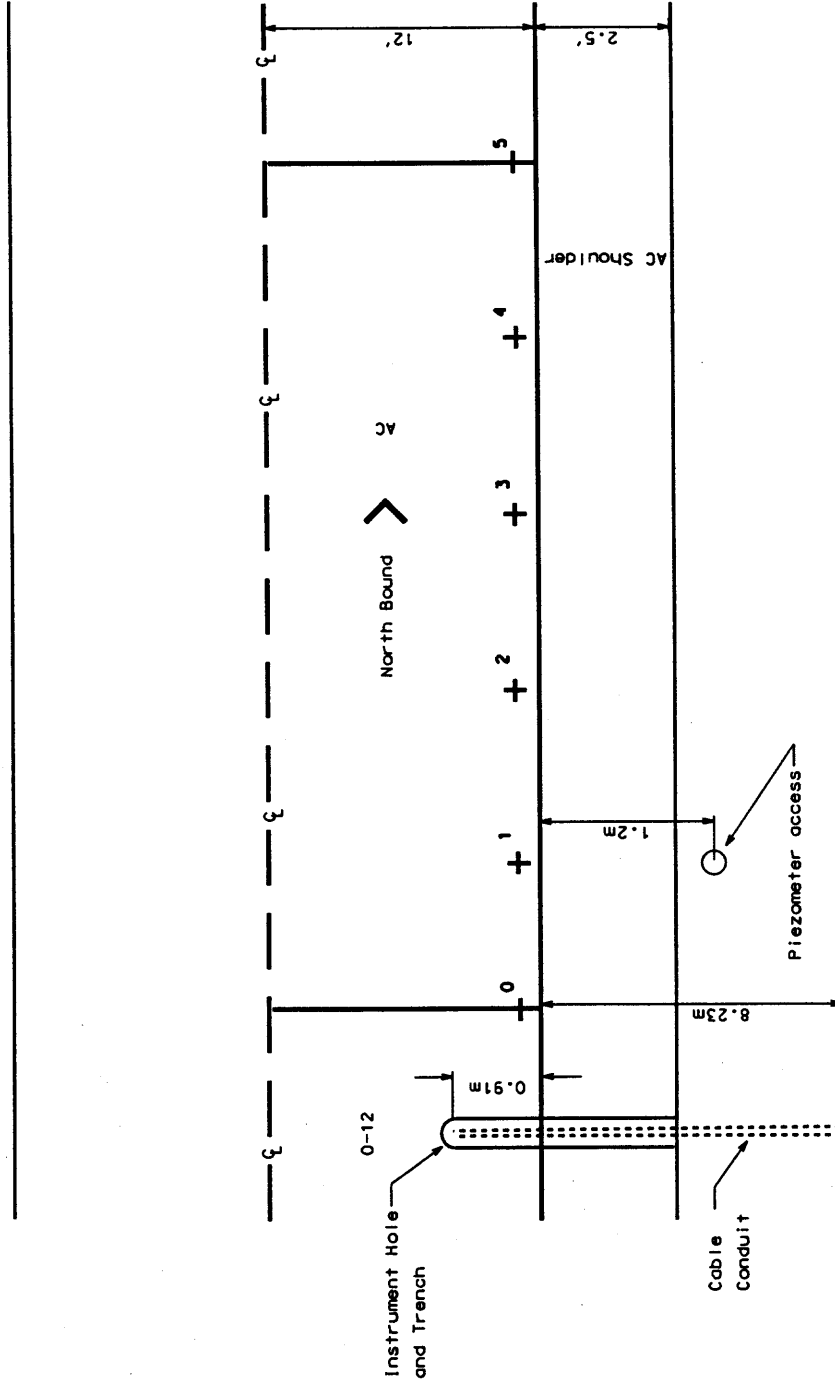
shows the locations of the installed instrumentation at the site after close-out. The instrument hole is at Station 0-12 and the piezometer is at Station 1+00. Table 3 gives the elevations of the portion of test section 371028 that was used for elevation measurements. All offsets are measured from the PK nails found at the outside pavement edge.
